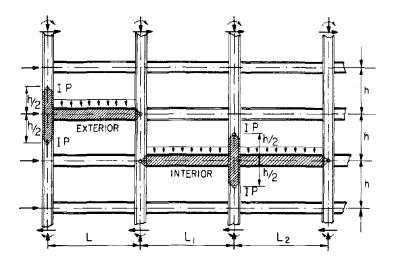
A Portion of a Moment-Resisting Frame Illustrating Possible Test Subassemblages for Exterior and Interior Columns (Krawinkler, et al. 1971)
